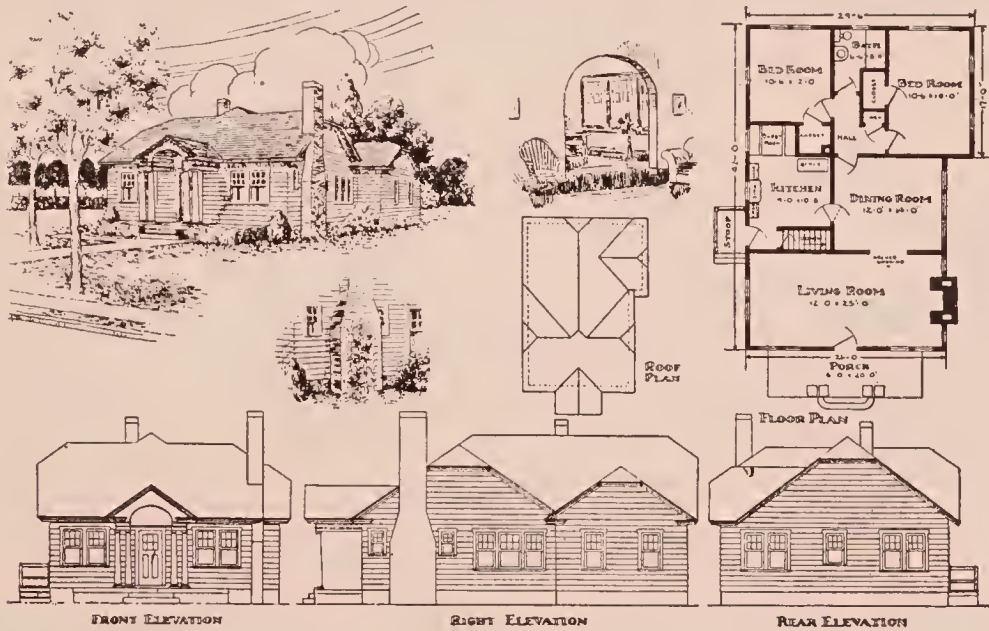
Floor plan, roof plan, two sketches, three elevations and a perspective sketch of a five-room house. (From "The Builder" for March 1926. Used by permission.)
